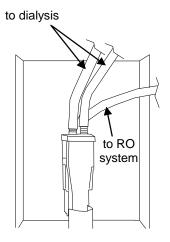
Unit is installed over the top rim of standpipe and inside an existing recessed wall box
